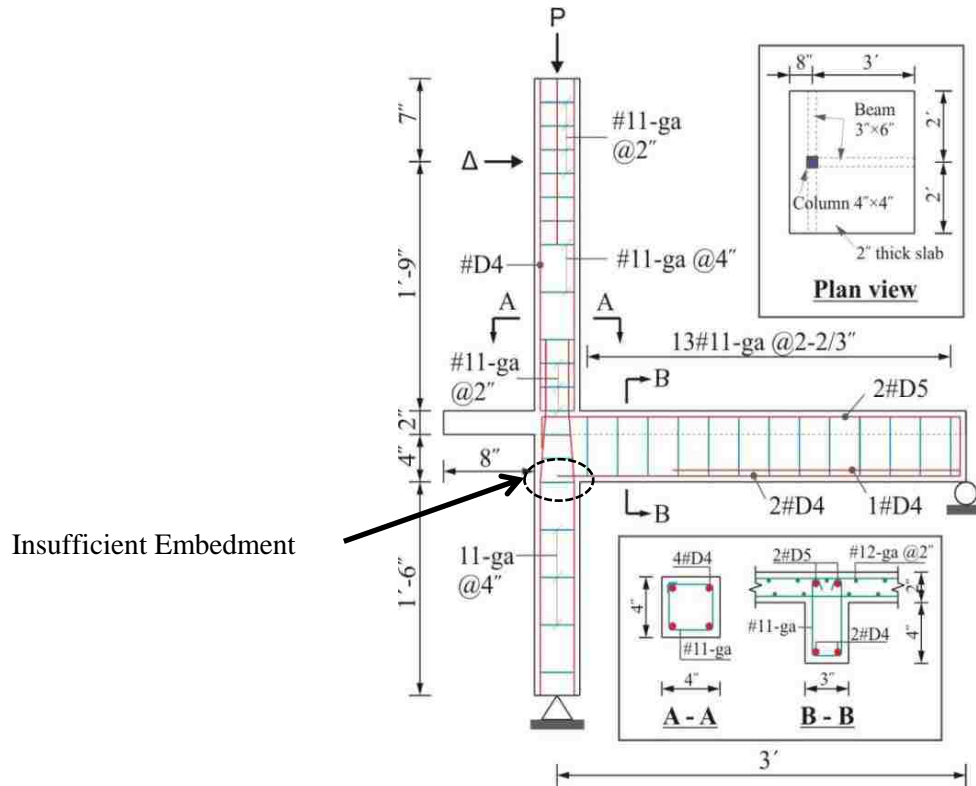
Steel reinforcement layout showing insignificant beam bottom bar embedment
